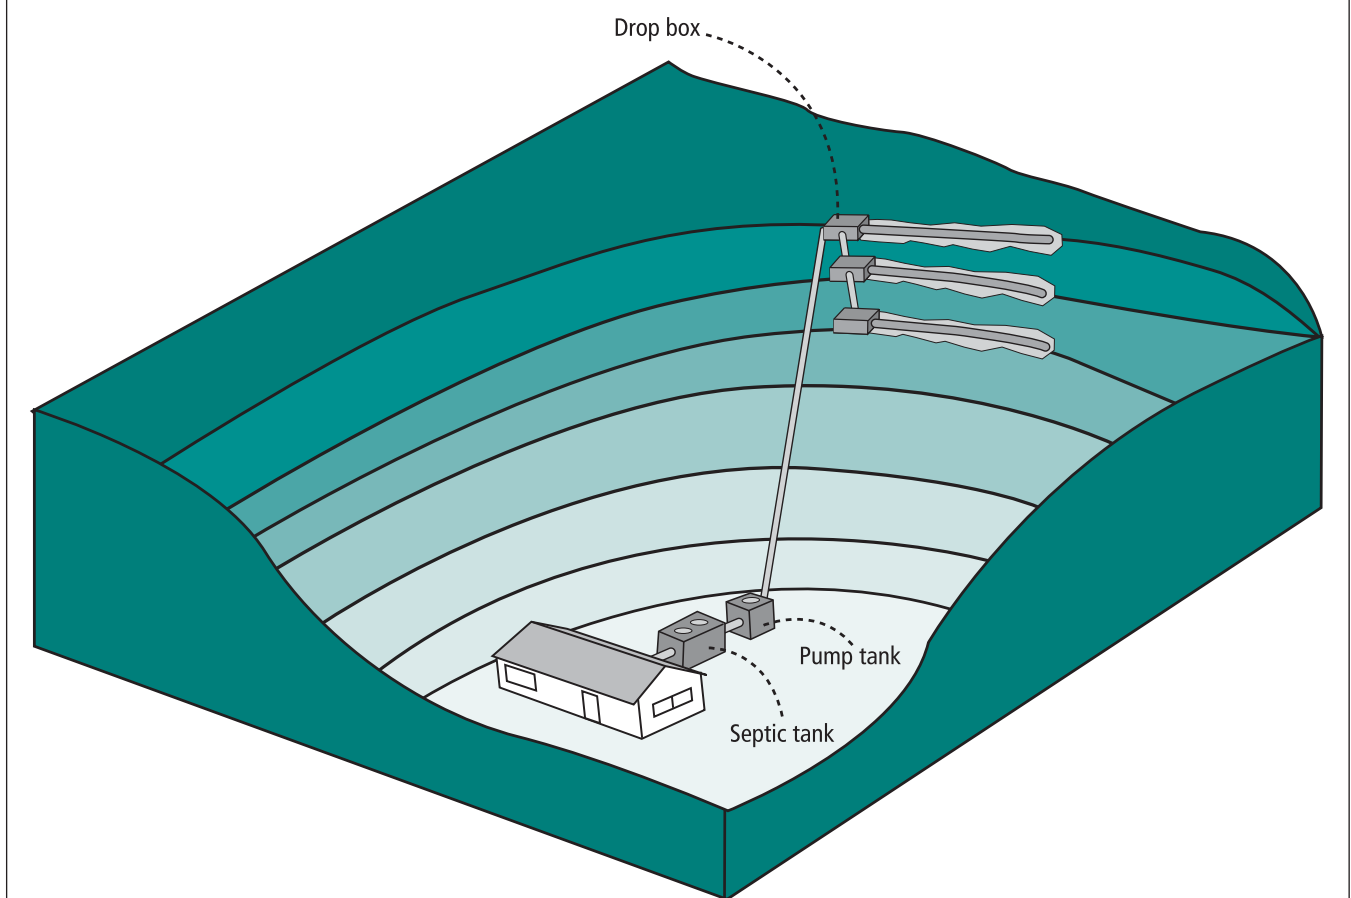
shows a typical pumping situation where the sewage source is at an elevation lower than where the soil is suitable for below grade, gravity sewage treatment and dispersal. Why not locate the house at an elevation high enough so that sewage could flow by gravity into the soil treatment unit? In some instances, the property owner may want the house at a certain elevation. In other instances, proper planning was not done with respect to the relative location of the house and the sewage treatment system. In the past, many people have incorrectly thought that low areas were suitable for sewage treatment, even though they were too wet for any other purpose.
